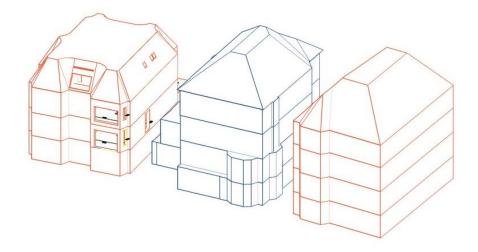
Aerial views of the proposed development with neighbouring properties - 59 Redington Road (left) and 63 Redington Road (right)
